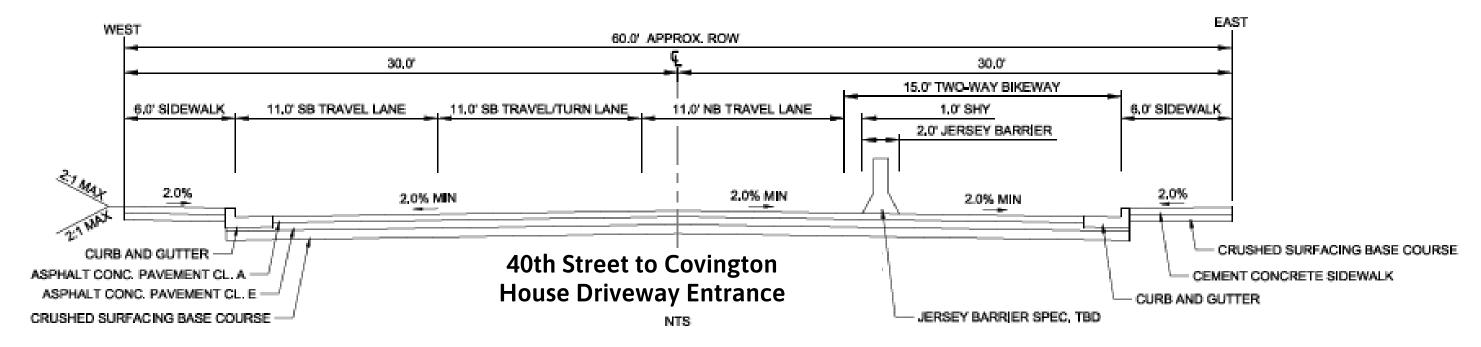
Cross section detail for Main Street between 40th Street and Covington House Driveway Entrance
